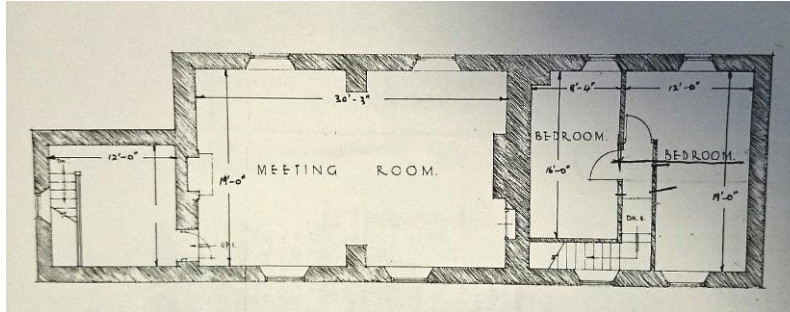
First floor plan of the meeting house as adapted by J.W. Beaumont and Sons 1939 (north is to the right; not to scale) (Disley Meeting House archive).
